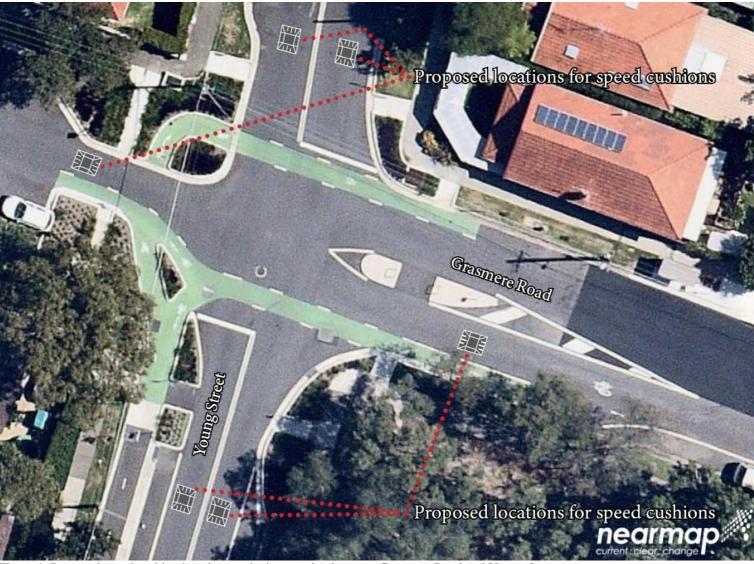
Proposed speed cushion locations at the intersection between Grasmere Road and Young Street
